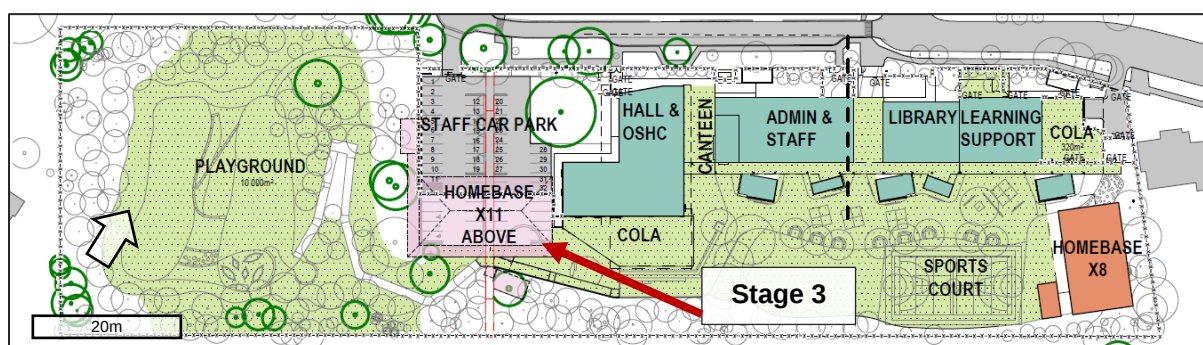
| Stage 3 site layout (Source: Applicant's RtS 2021)
